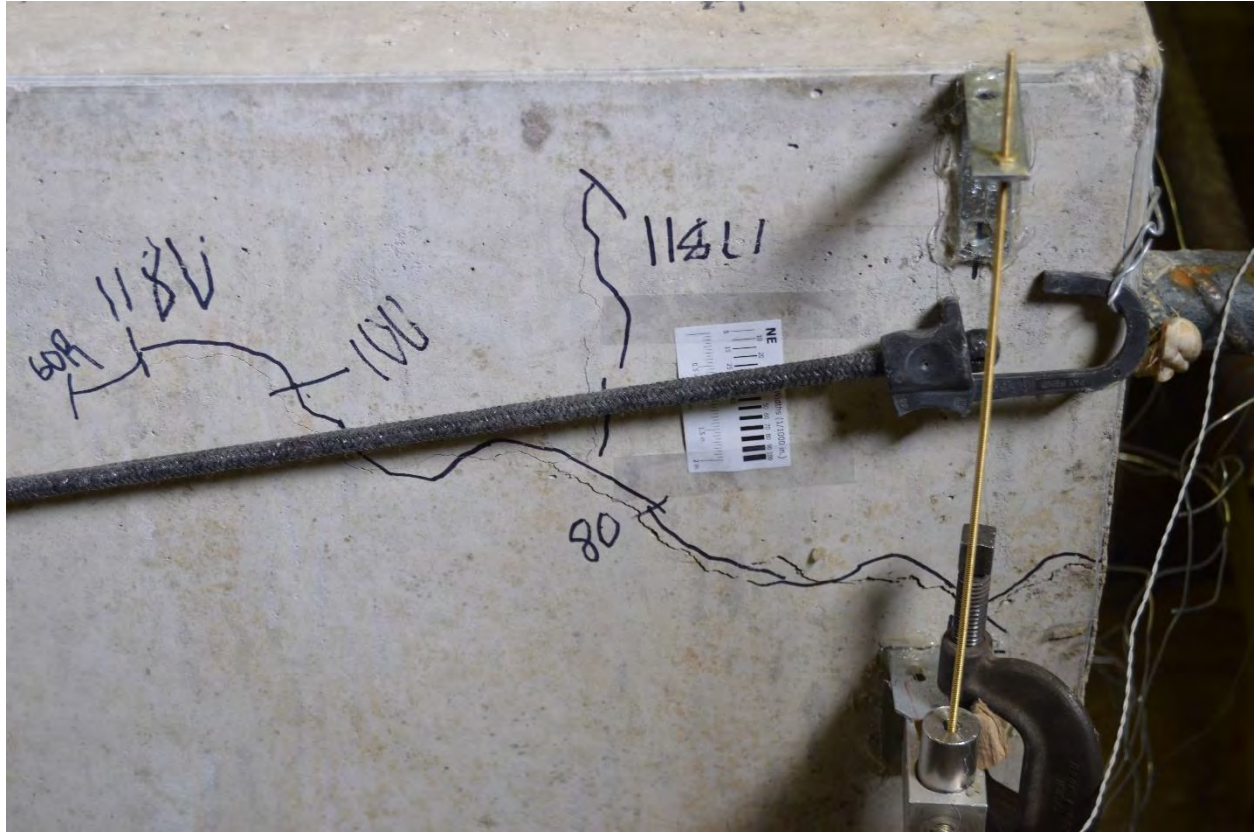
Test Photo Specimen D12, NE corner, 120 kips
